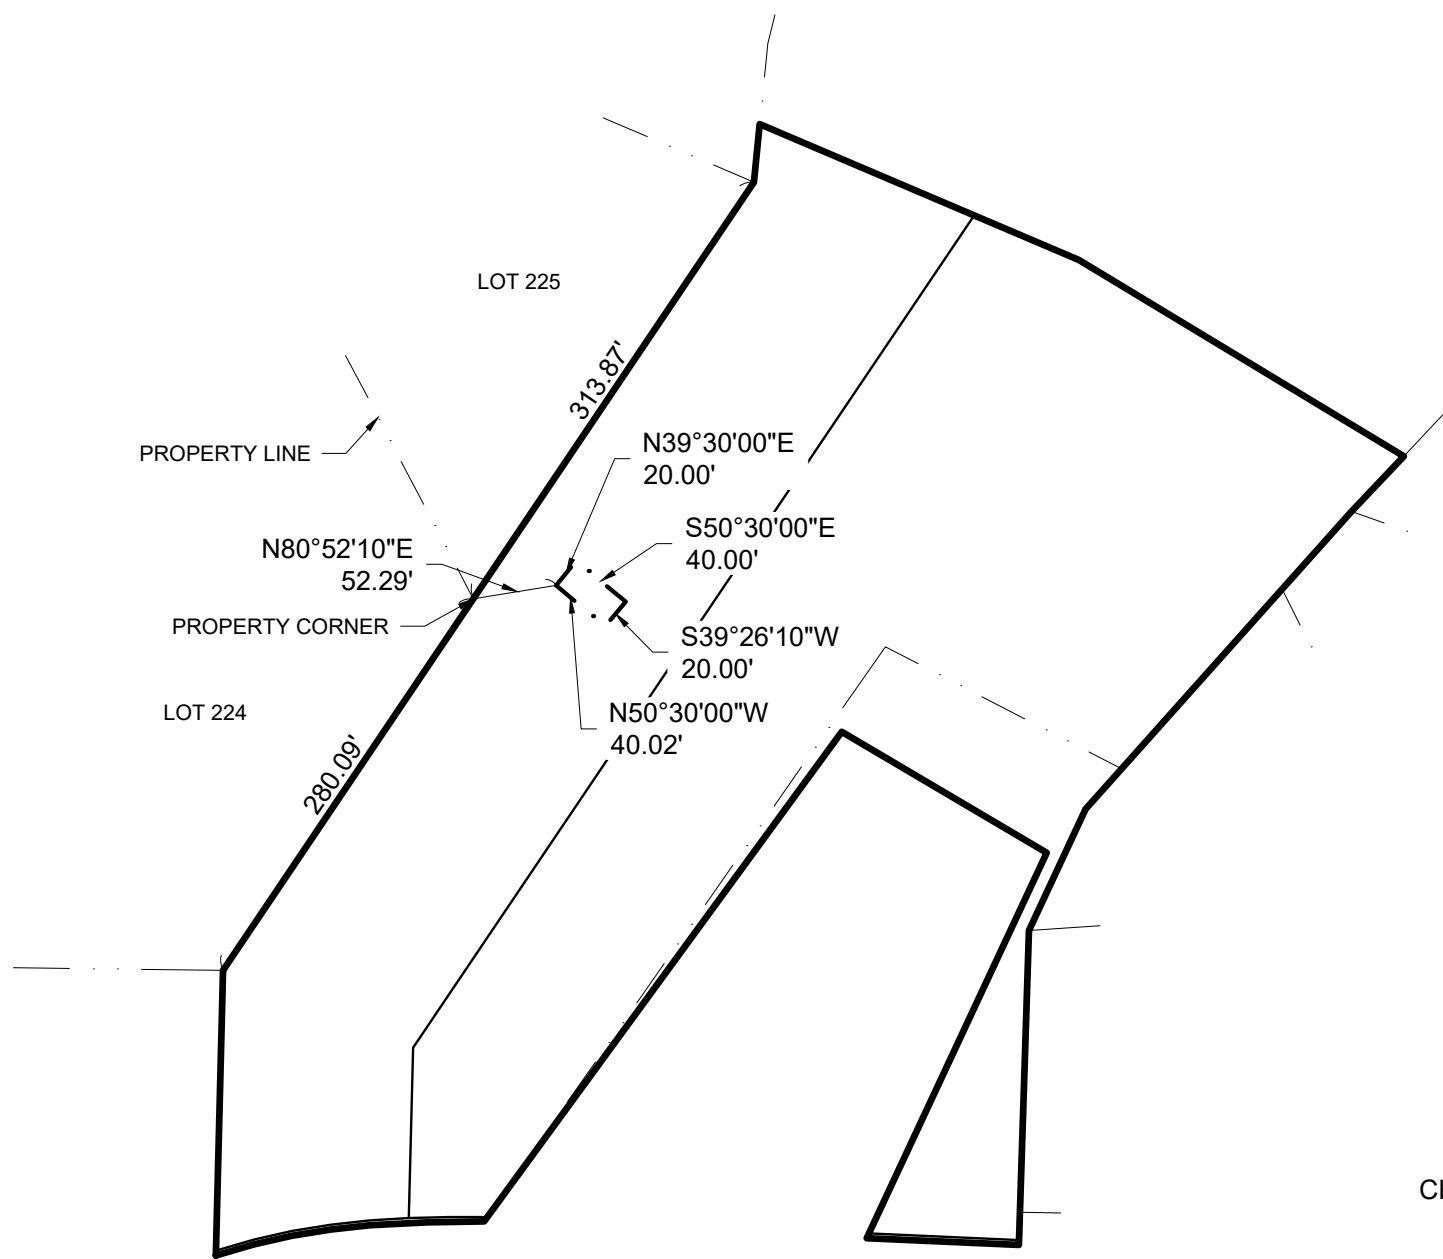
DETAIL 'B' - SEWER EASEMENT - BK 1876 PG 405
